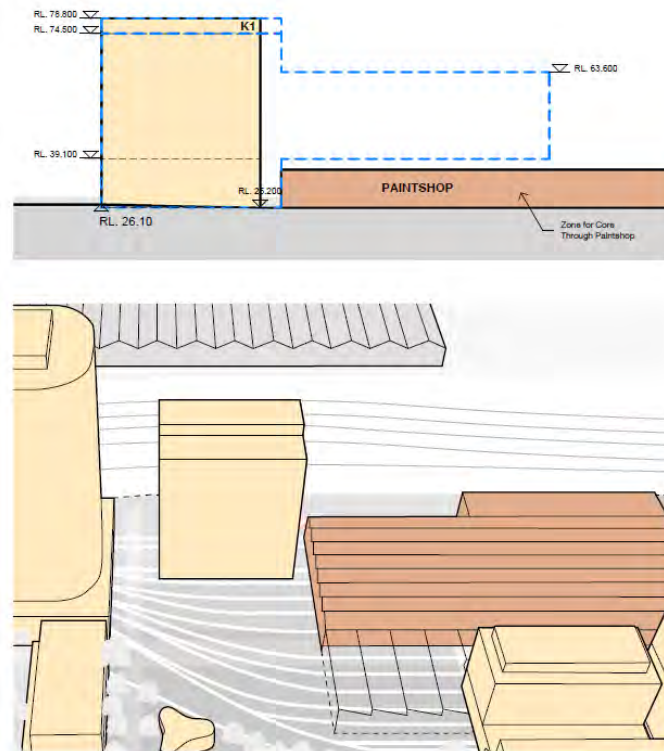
Building envelopes proposed for 'Approach 2' shows no development over the Paint Shop and 12-storeys for Building K (Source: Bates Smart 2022;p126)
